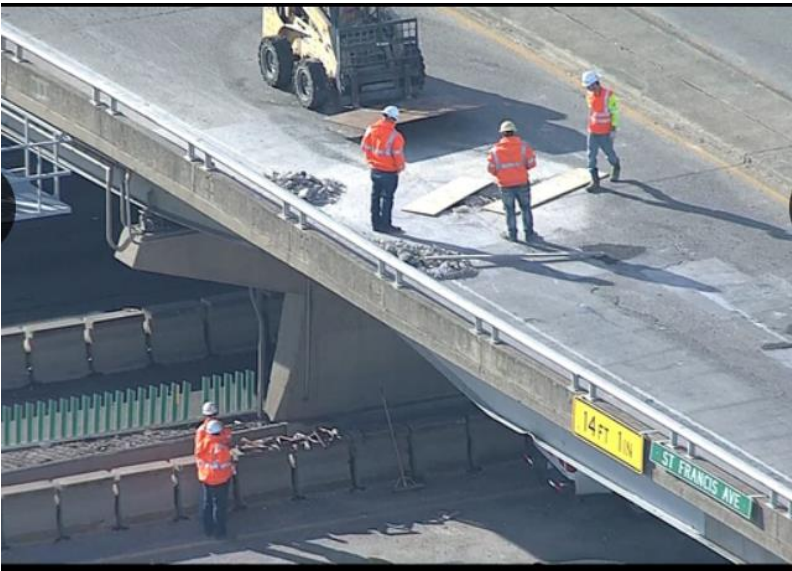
4 Wrecker pierced through the concrete deck (Fox 4 News 2017)
